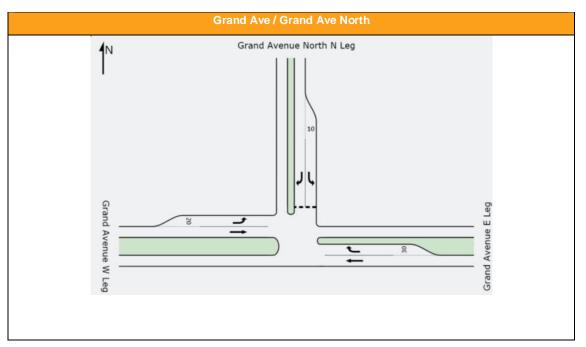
Intersection Layout - Grand Avenue / Grand Avenue North (Source: AECOM, 2012)
